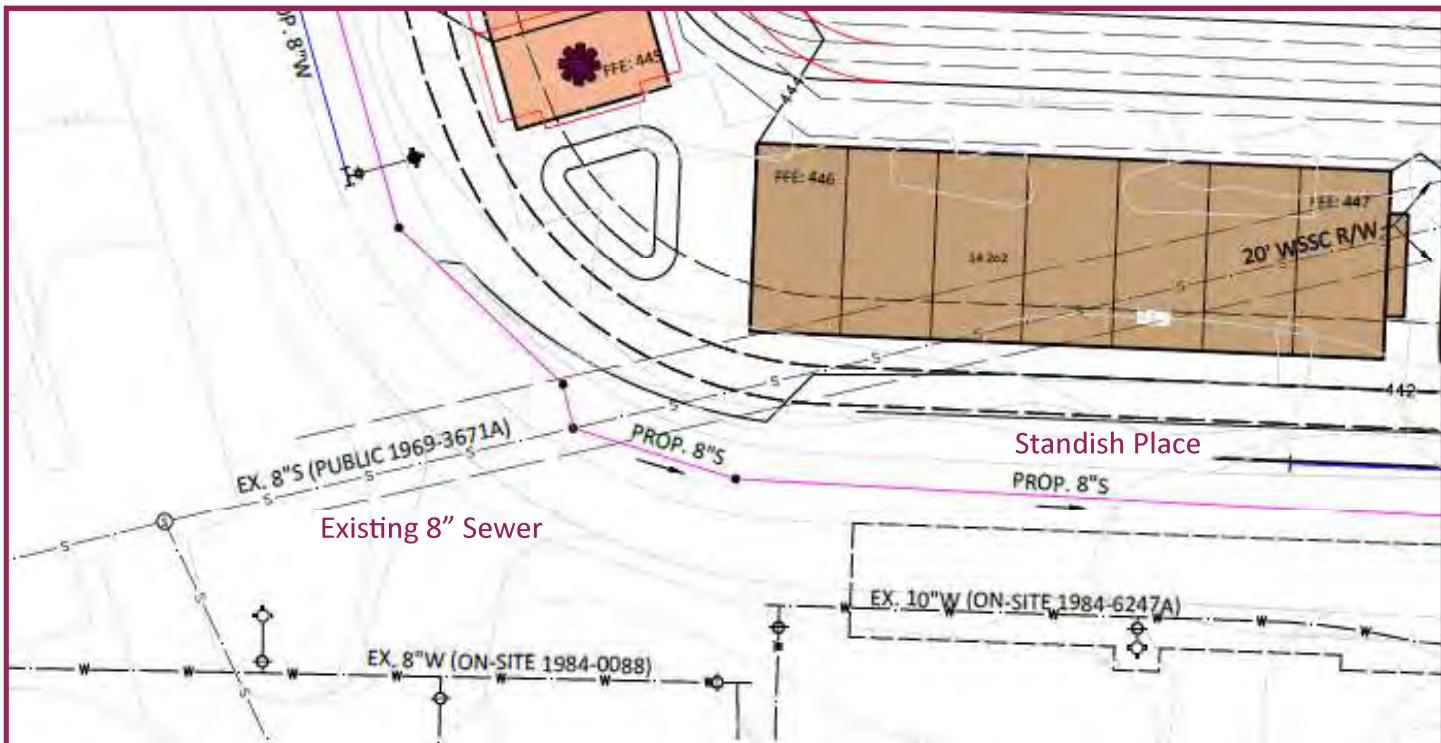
Existing Sewer Main Location (with Proposed Site Layout)
